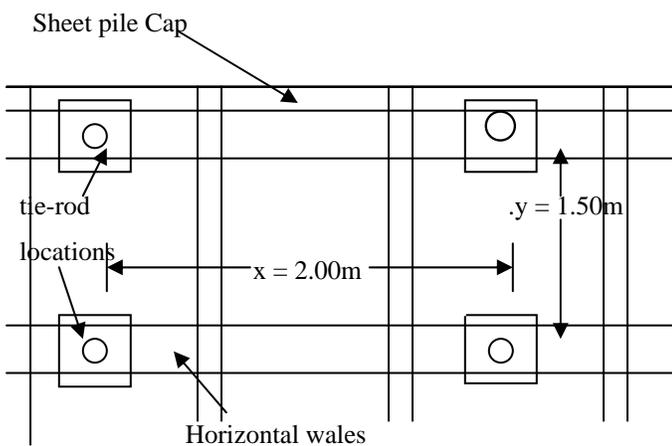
Schematic diagram showing the vertical distance between two Wales at the backfill face of the sheet piling.
